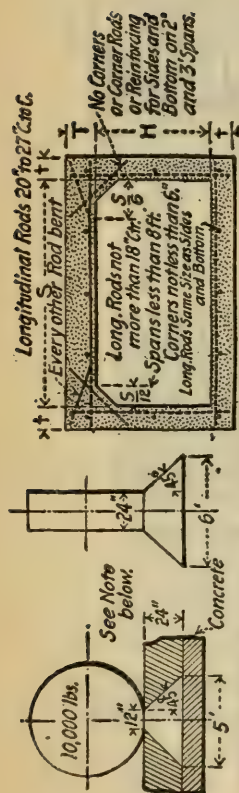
New York State small box culverts. Suitable for firm foundation soils. On soft soils use reinforced culverts, Fig. 66, page 222 and Fig. 67, page 224.
